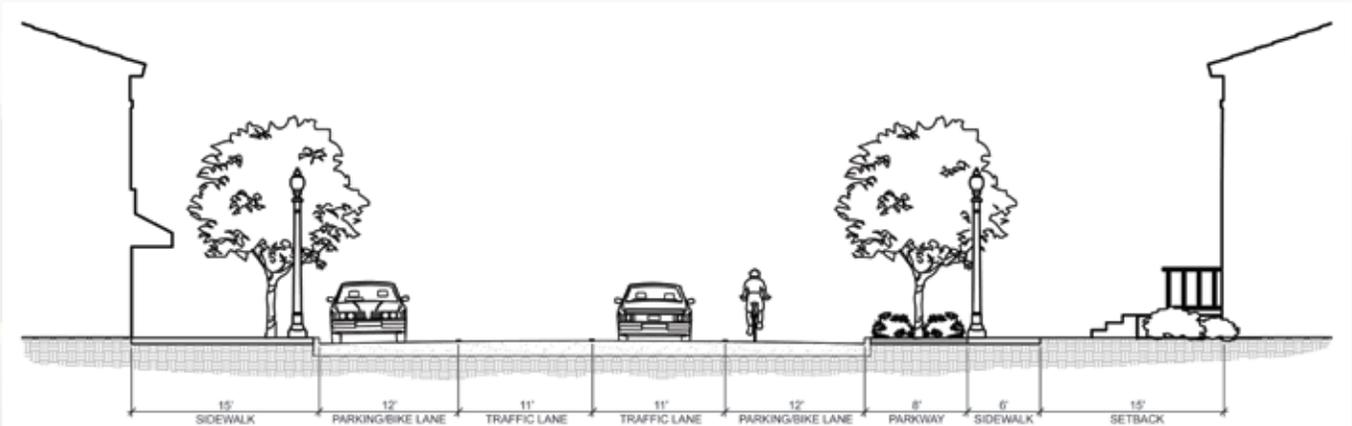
Proposed cross section of Lake Street north of Orange Avenue
